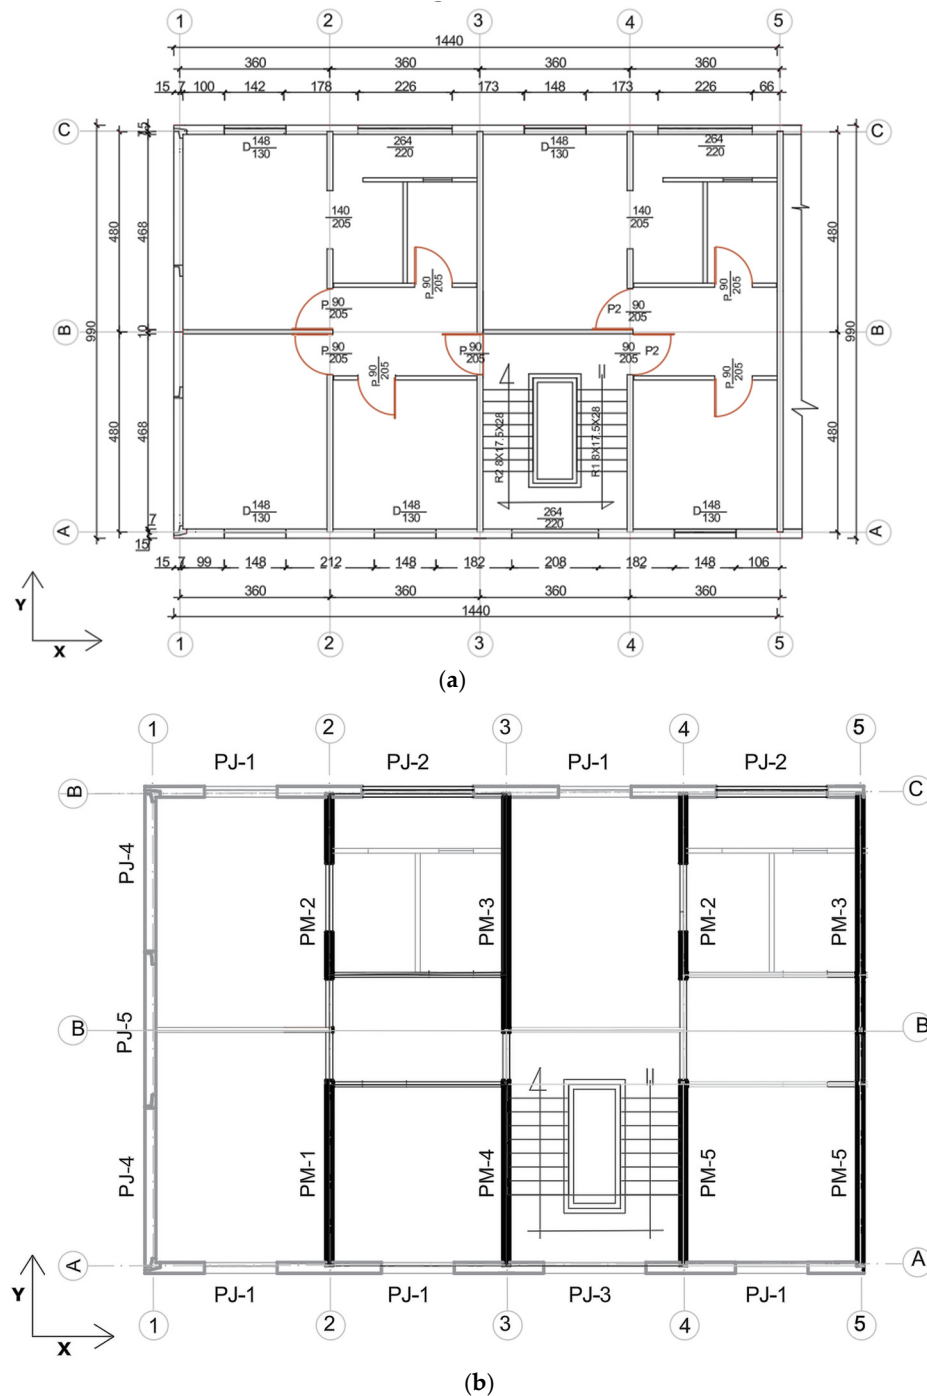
Floor plan for a typical LPB building block: (a) architectural plan showing the interior wall layout and (b) structural plan with cross-wall system (all dimensions in cm).
